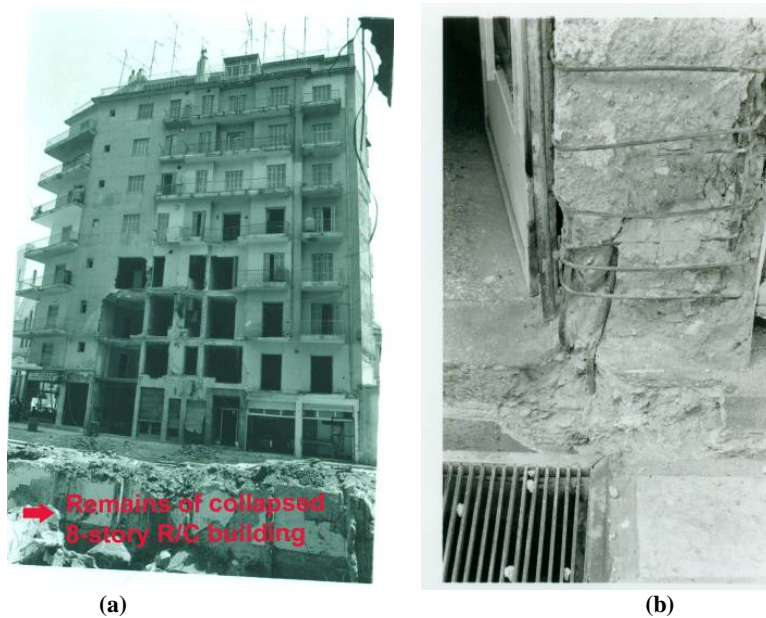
(a) The remains of the collapsed building together with the damaged adjacent structure; (b) Damaged column at the ground “soft story” floor.
